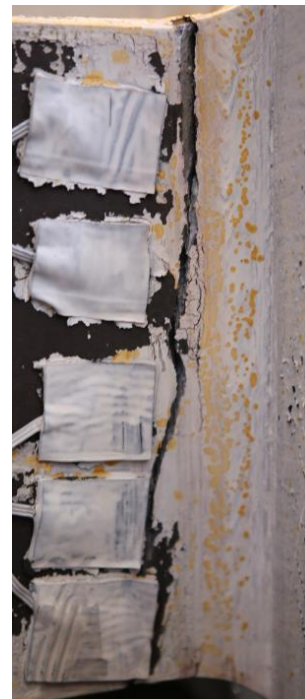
Specimen W4: East Beam Top Flange Fracture during First Excursion of -0.05 rad
